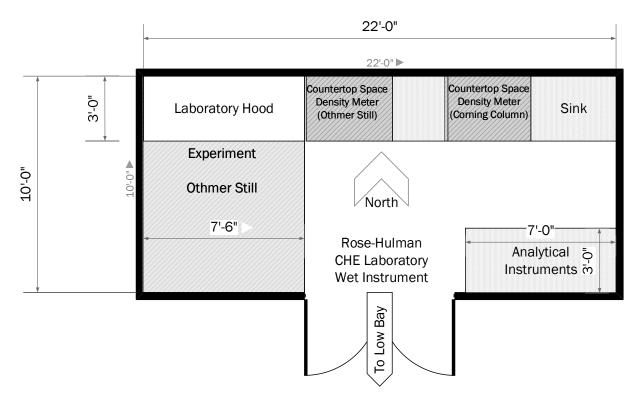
Wet Instrument Laboratory (O-102A) Floor Plan
